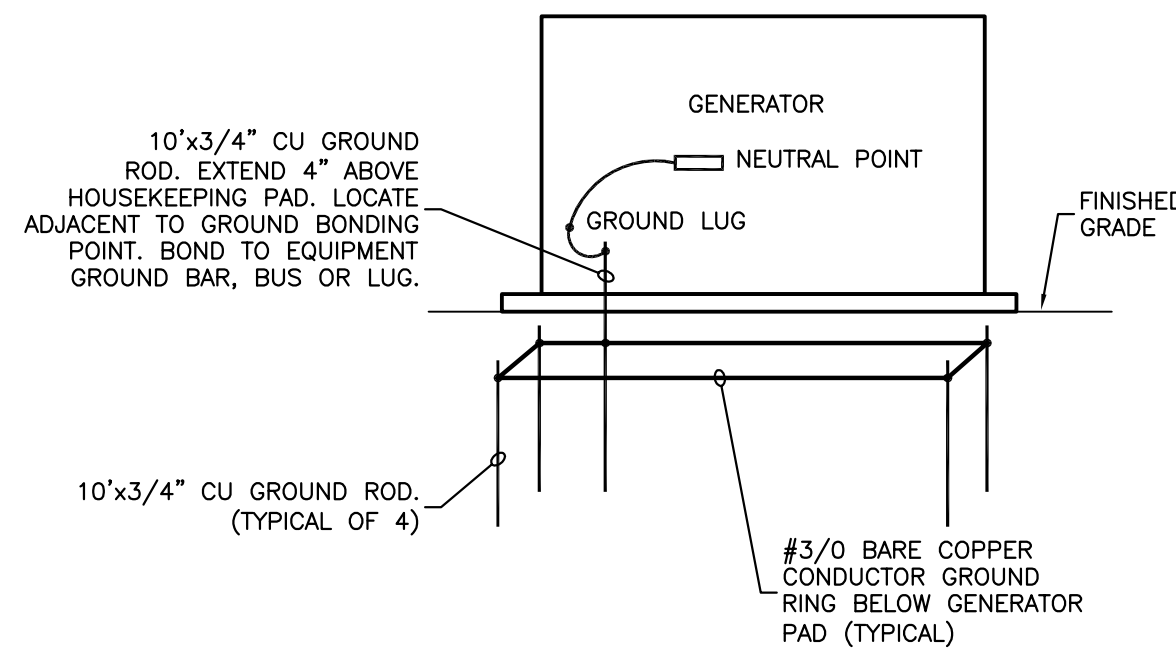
DETAIL SERVICE EQUIPMENT GROUNDING DETAIL
